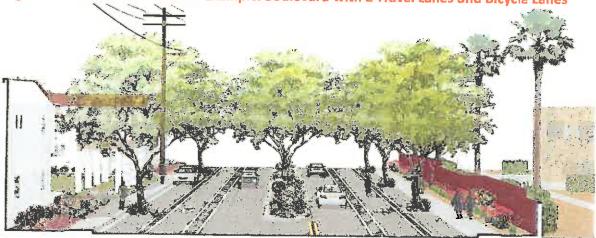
Street Cross Section Example: Boulevard with 2 Travel Lanes and Bicycle Lanes
